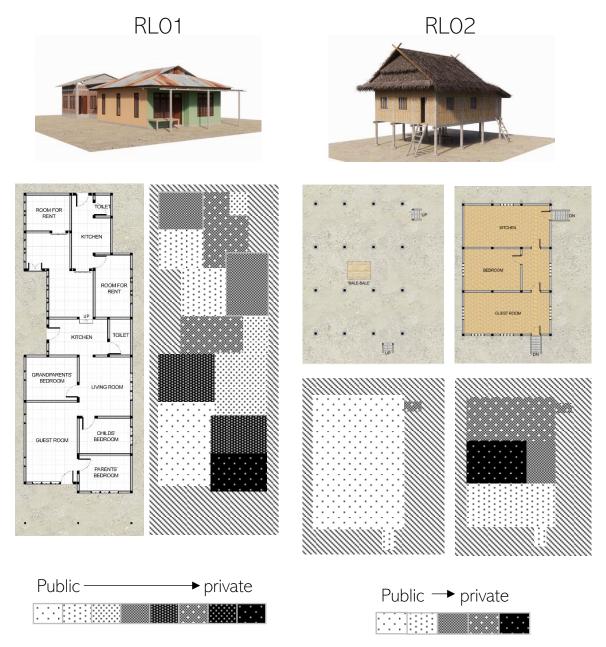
RL's houses in Sernaru with 3D render, floor plan and layout analysis
